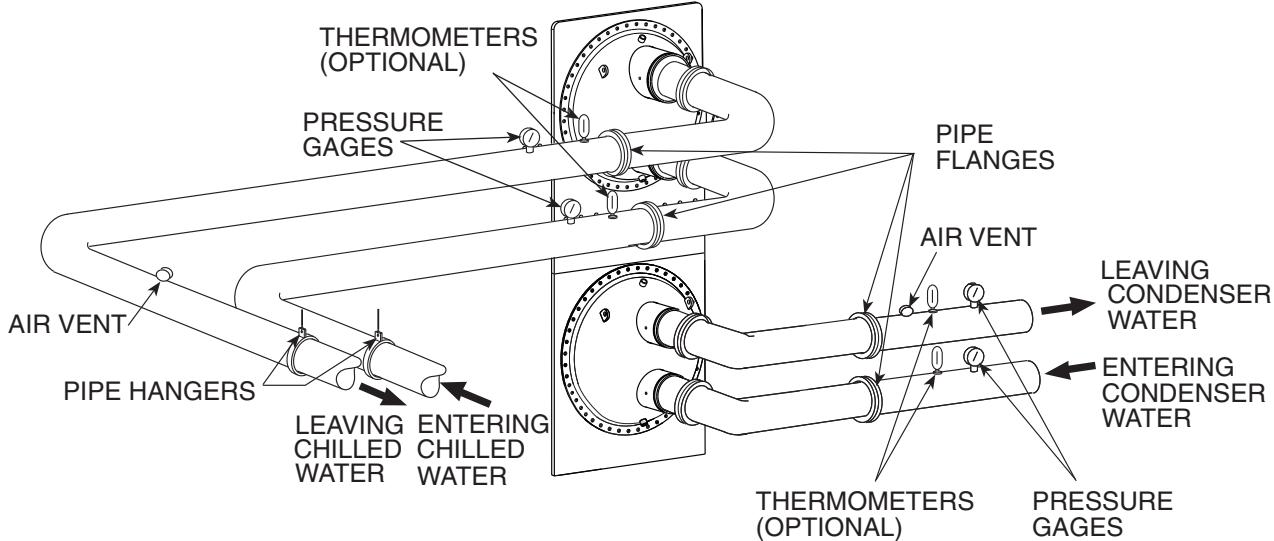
Typical Evaporator and Condenser Piping and Wiring — 30XW325-400
